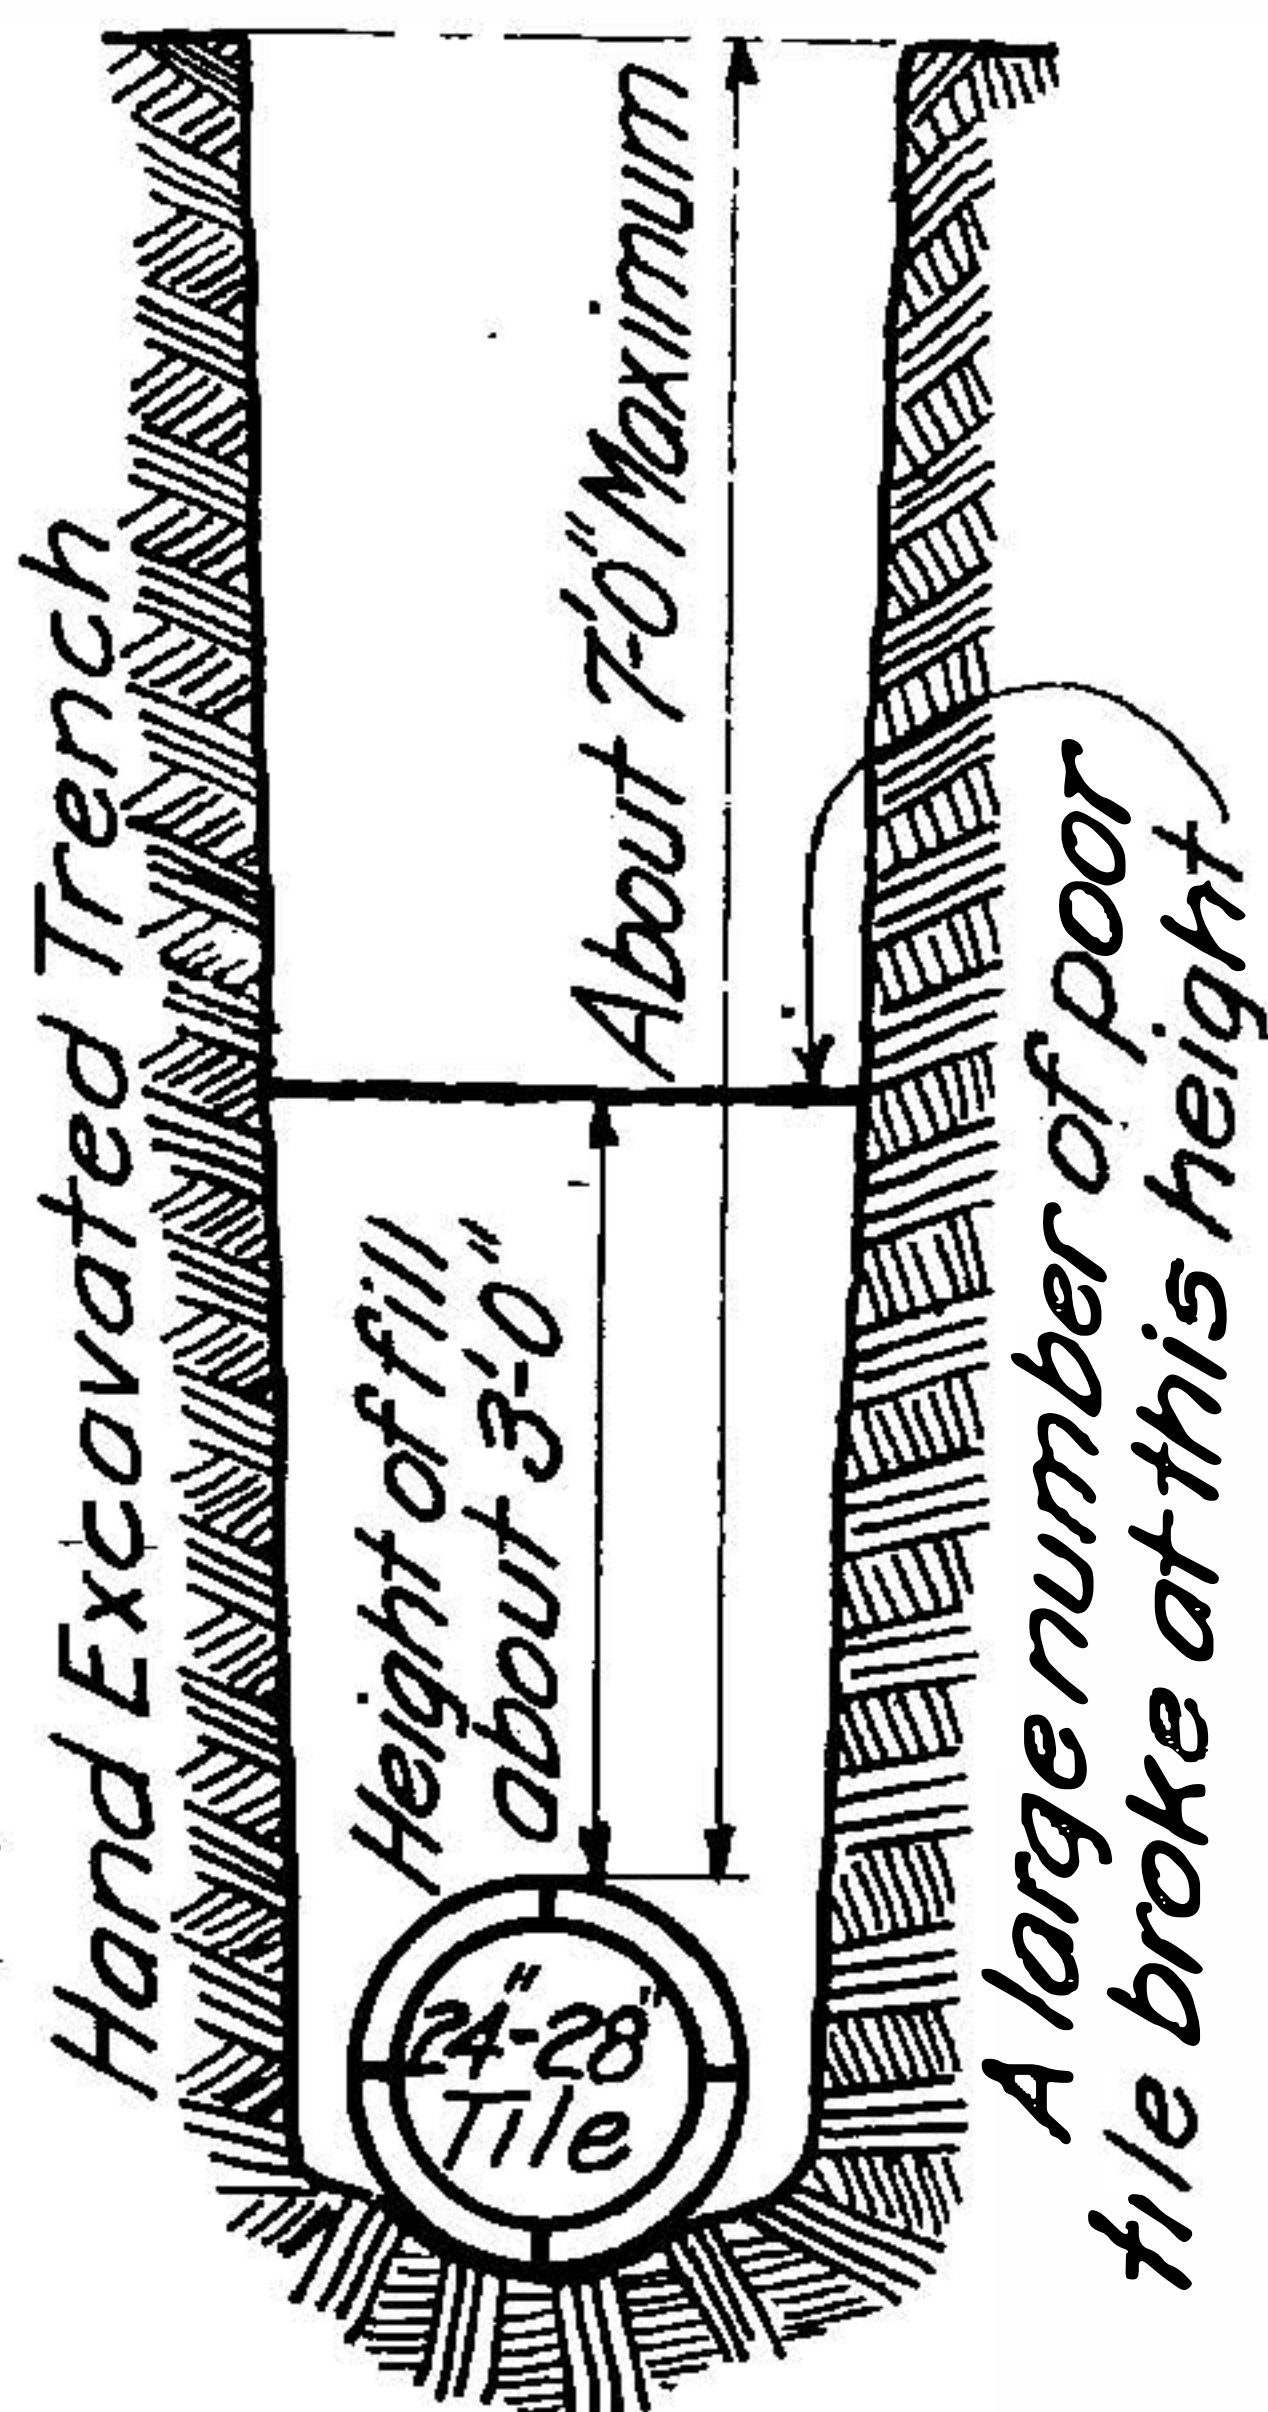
Cracking of 24 to 28 Inch Cement Drain Tile during Construction, in Drainage District No. 40, Emmet Co., Iowa.
